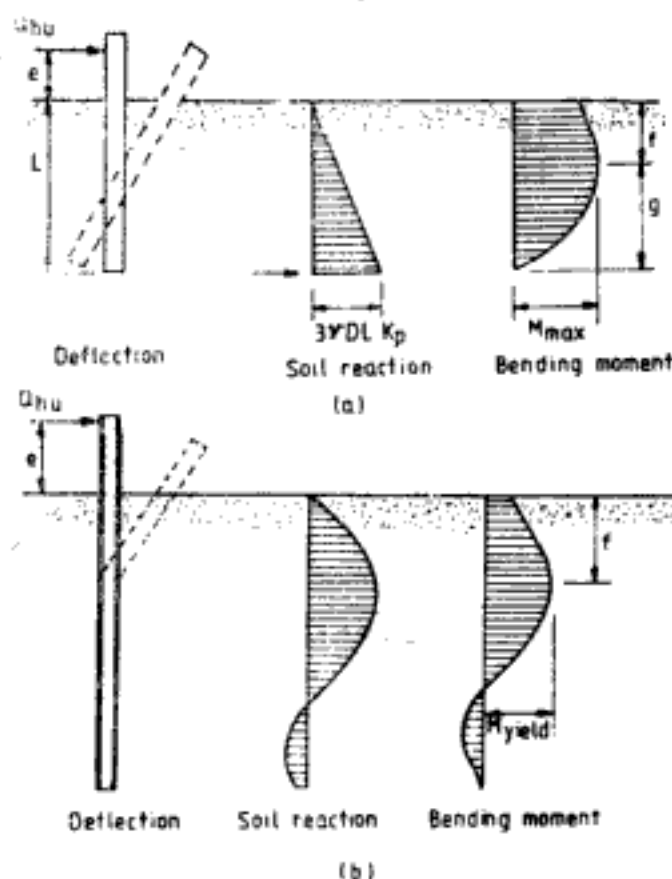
Failure mechanisms of free head piles in sand: (a) short piles, and (b) long piles (After Broms, 1964b; with permission of American Society of Civil Engineers, New York)
